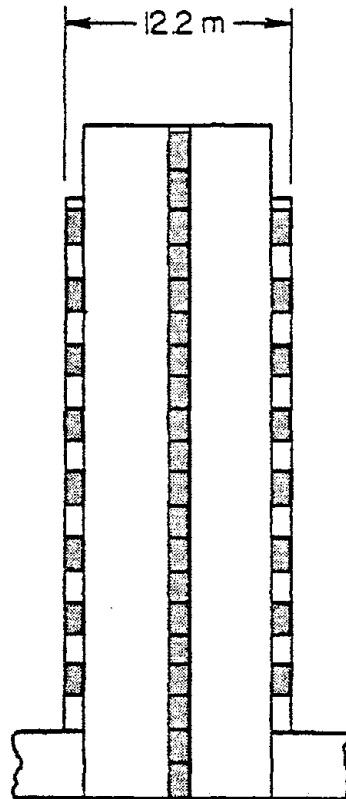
Elevation View of the British Rail Building in the Short Direction.
